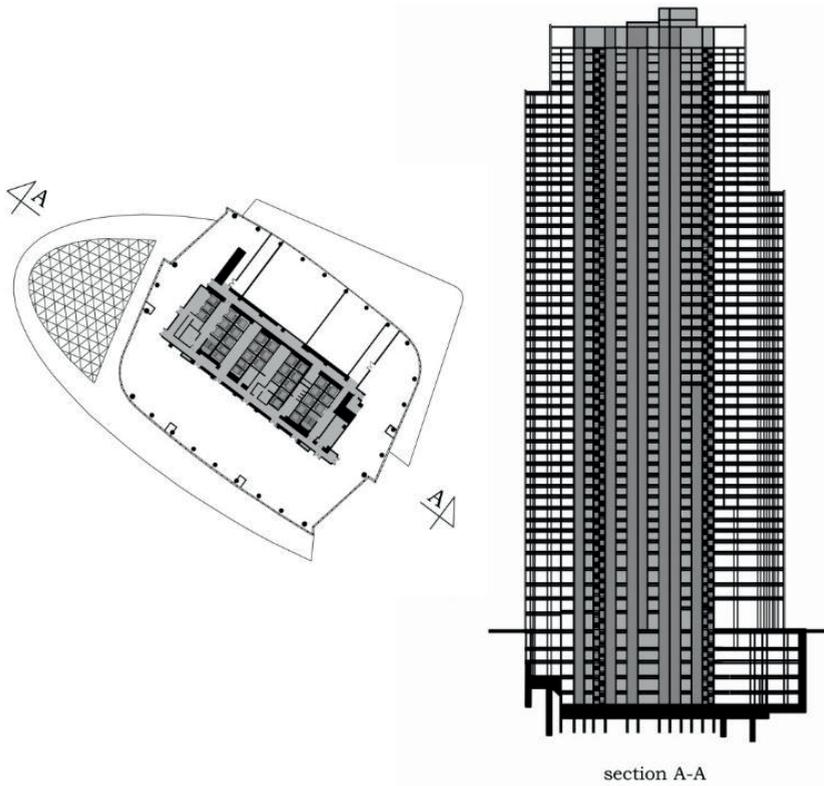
Toranomom Hills: floor plan and section, developed by authors [12]
